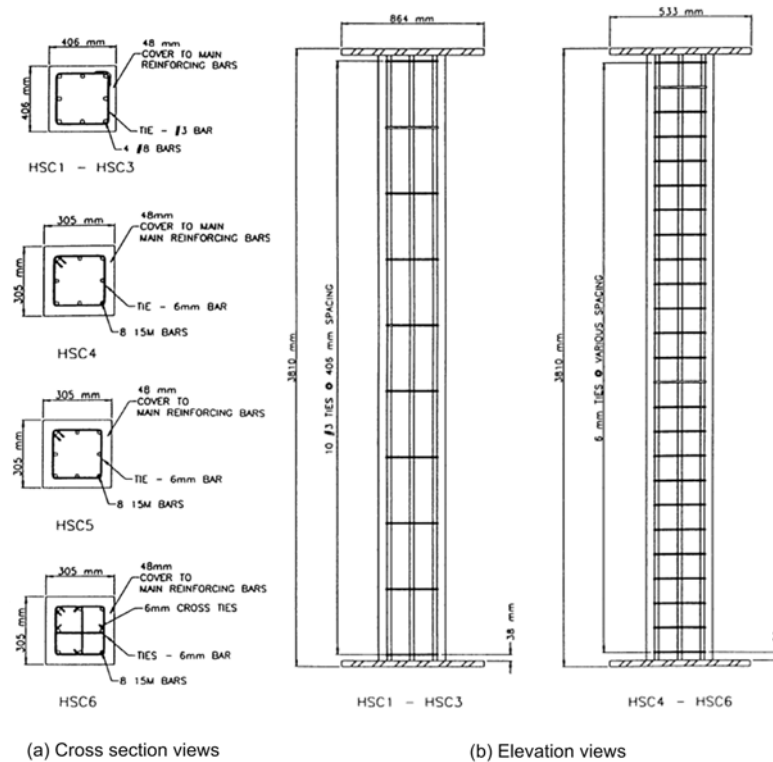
Elevation and cross sectional details of HSC columns (Kodur and McGrath, 2003)
